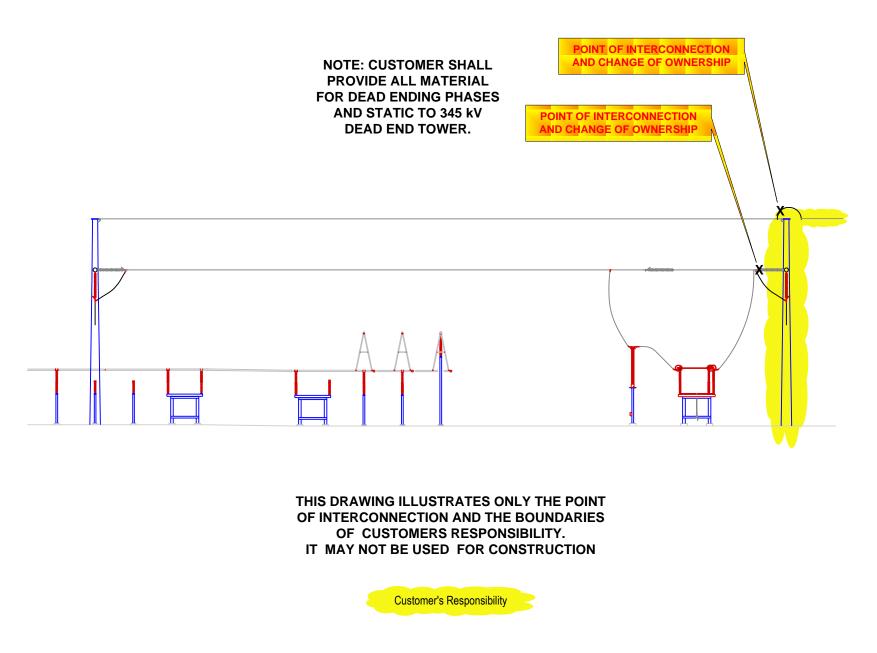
New Switching Station Interconnection Facility Preliminary Elevation View
